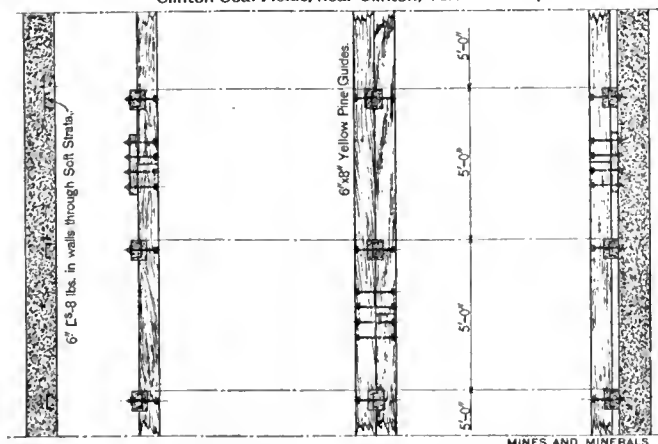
RECTANGULAR CONCRETE HOISTING SHAFT, WITH STEEL CHANNEL BUNTONS
